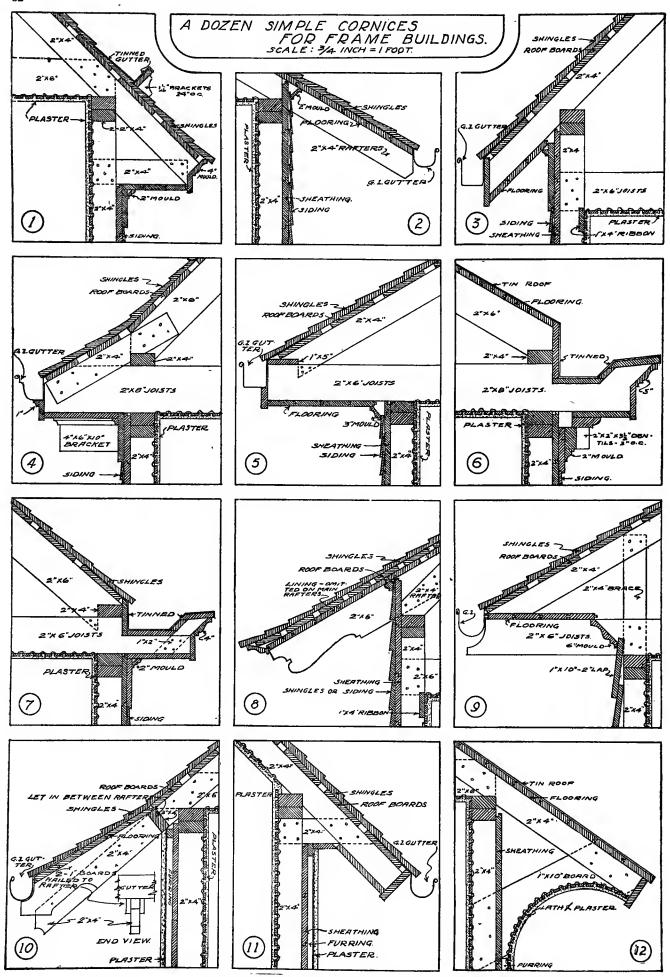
CORNICE CONSTRUCTION FOR FRAME BUILDINGS
